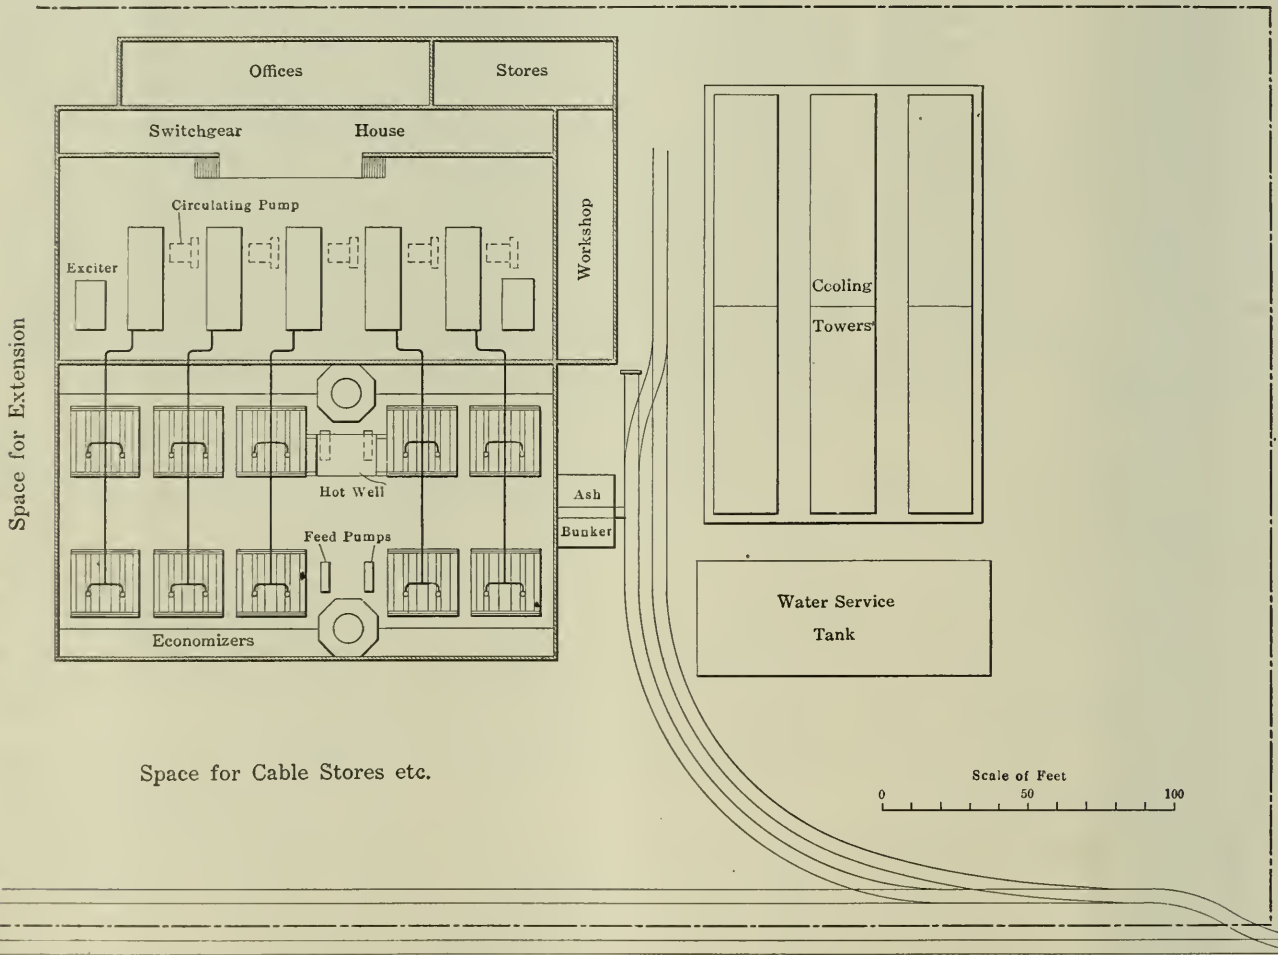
PLAN OF 10,000-KILOWATT STEAM PLANT
